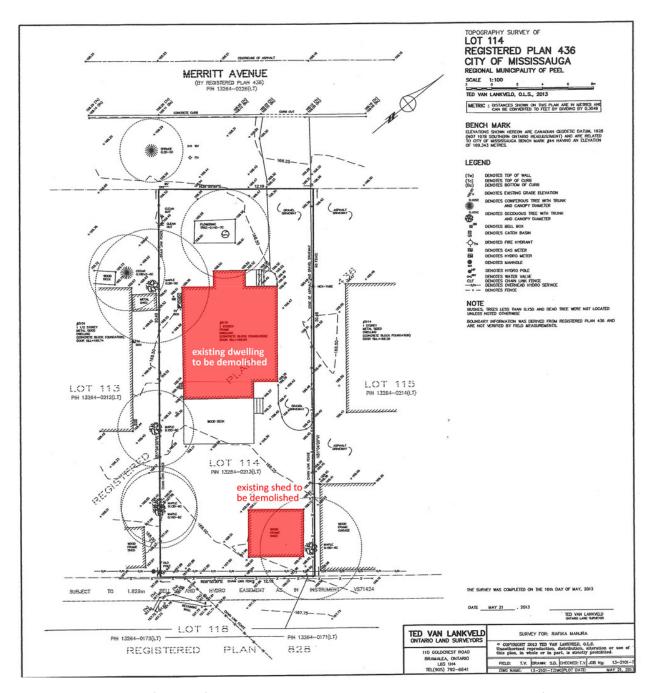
2013 Plan of Survey for Lot 114 showing the existing buildings, driveway and fencing.
